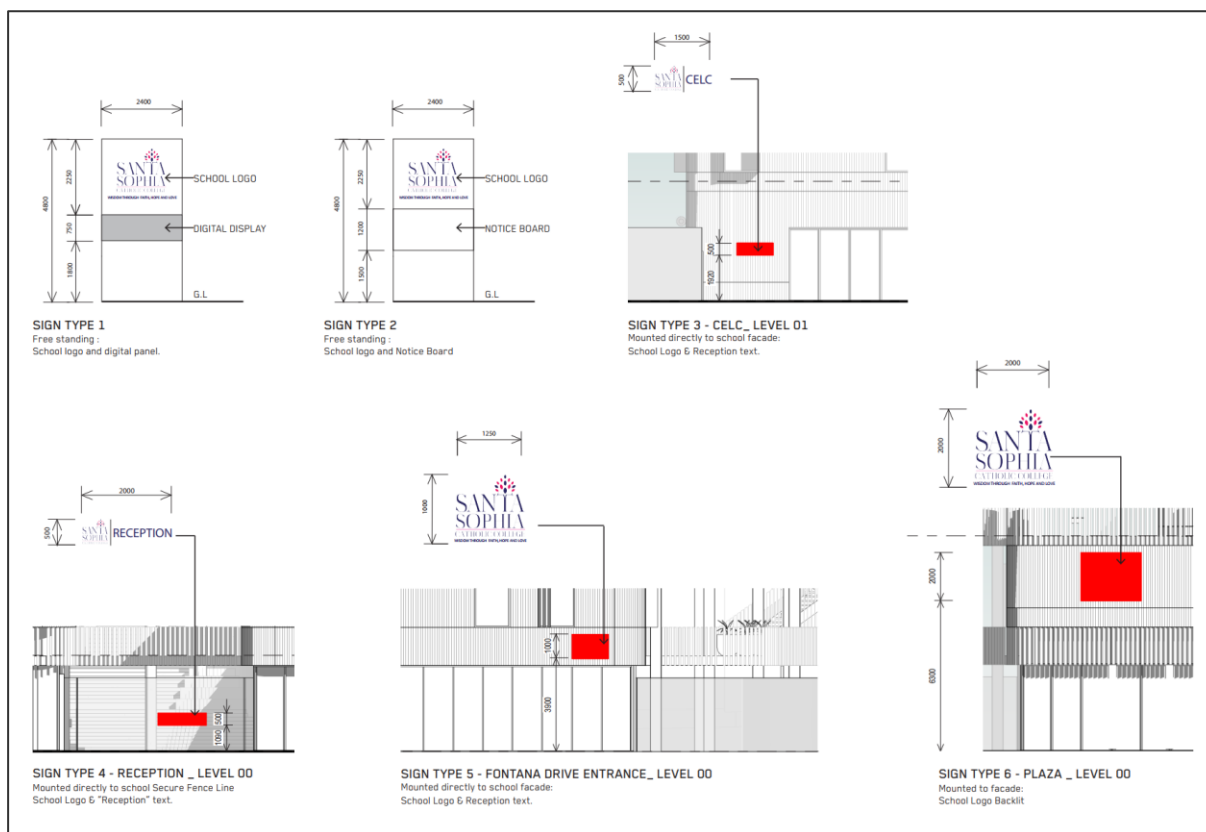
| Proposed school signage design, location and content (Source: Applicant's EIS)
